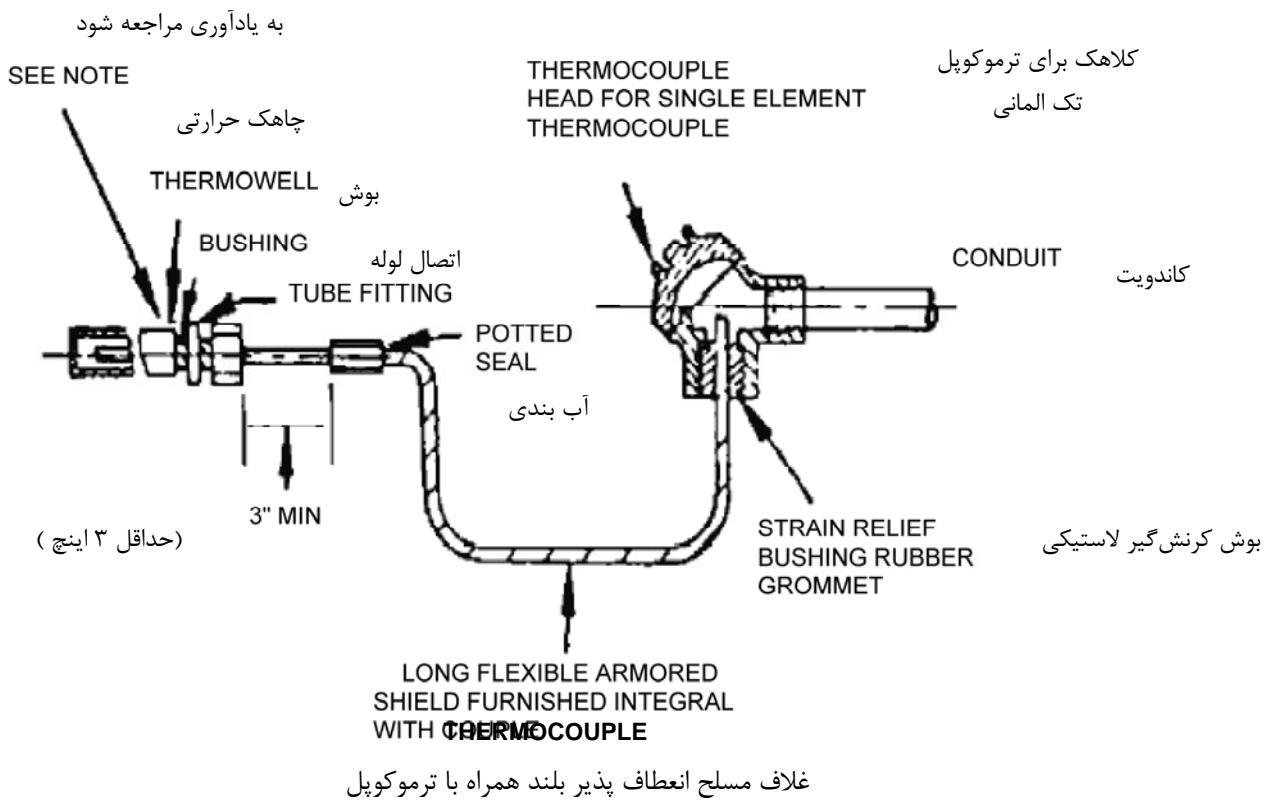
SHEATHED-TYPE THERMOCOUPLE AND HEAD ASSEMBLY
